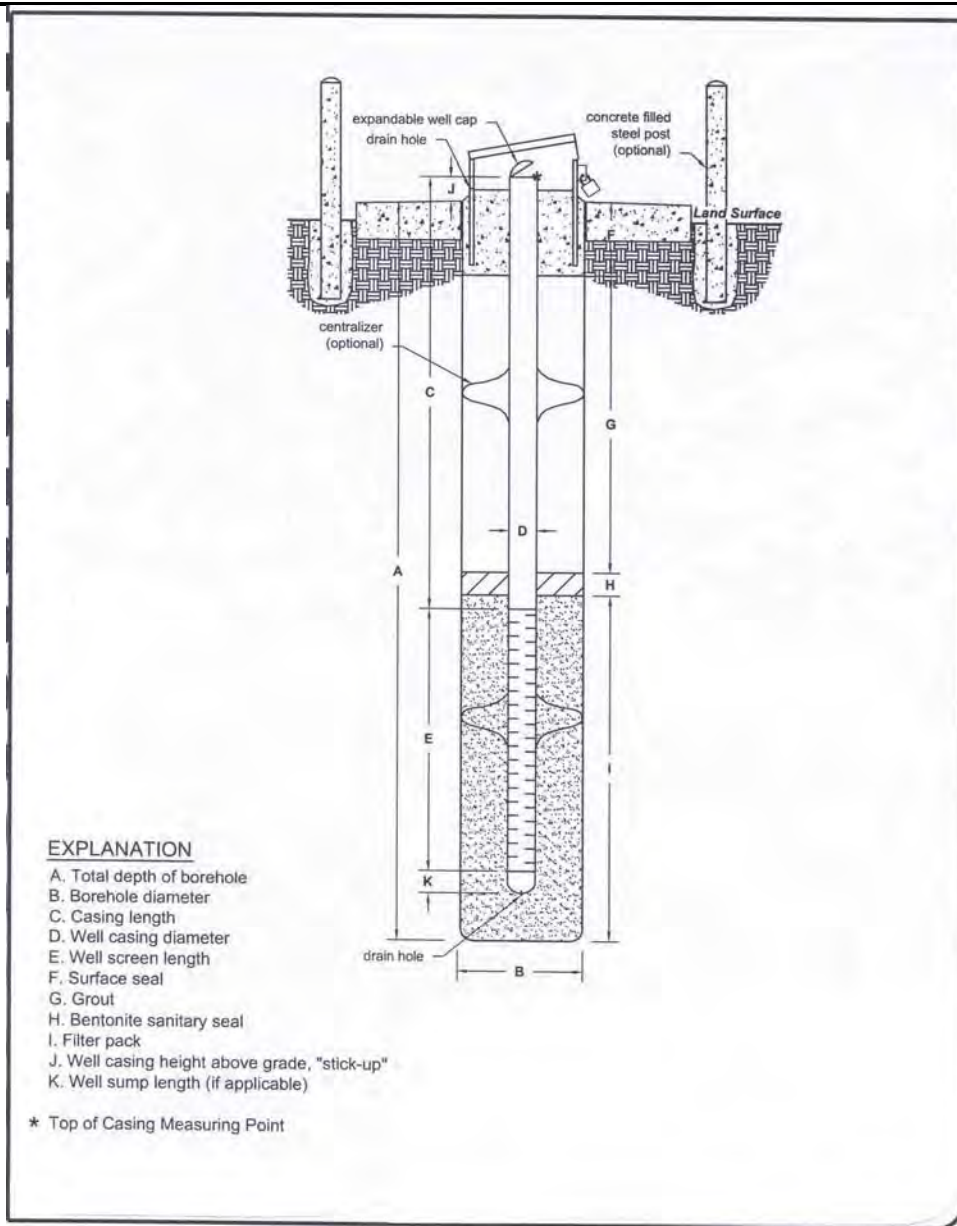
General monitoring well design for ground water sample collection at wastewater land application sites.⁷
